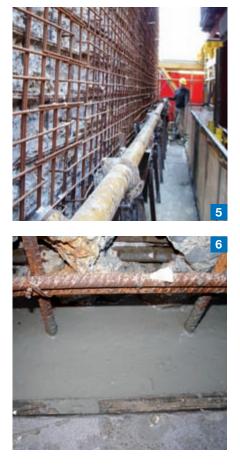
A steel piping was laid along the pillar and used to distribute the concrete.
